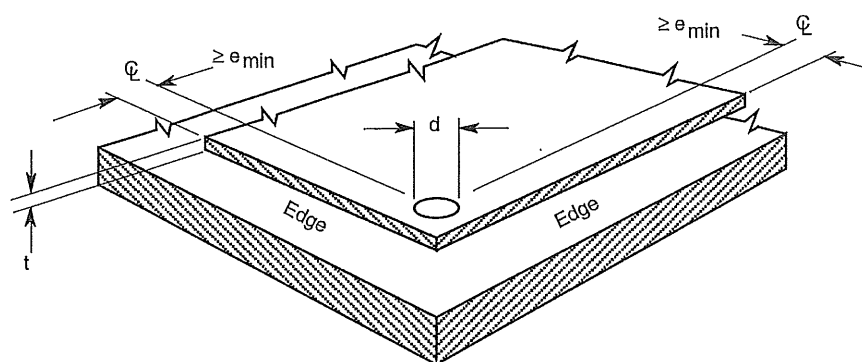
Edge Distance for Arc Spot Welds – Single Sheet
